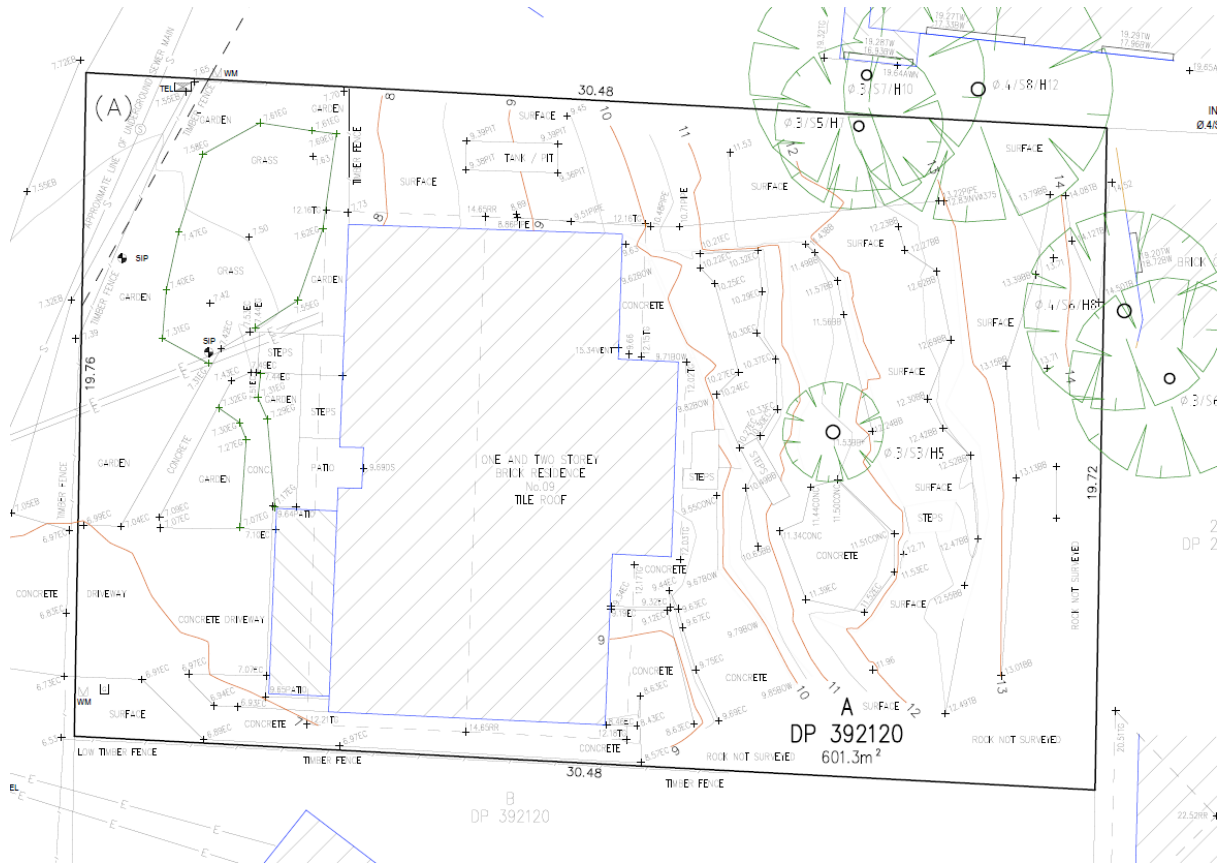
excerpt from land survey showing the steep change in levels within the site at the front of the existing dwelling
